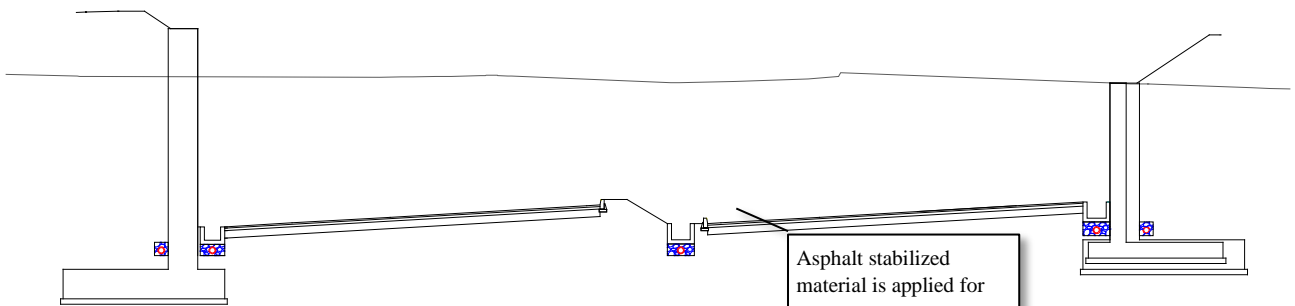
Typical Cross Section in Depressed Section
